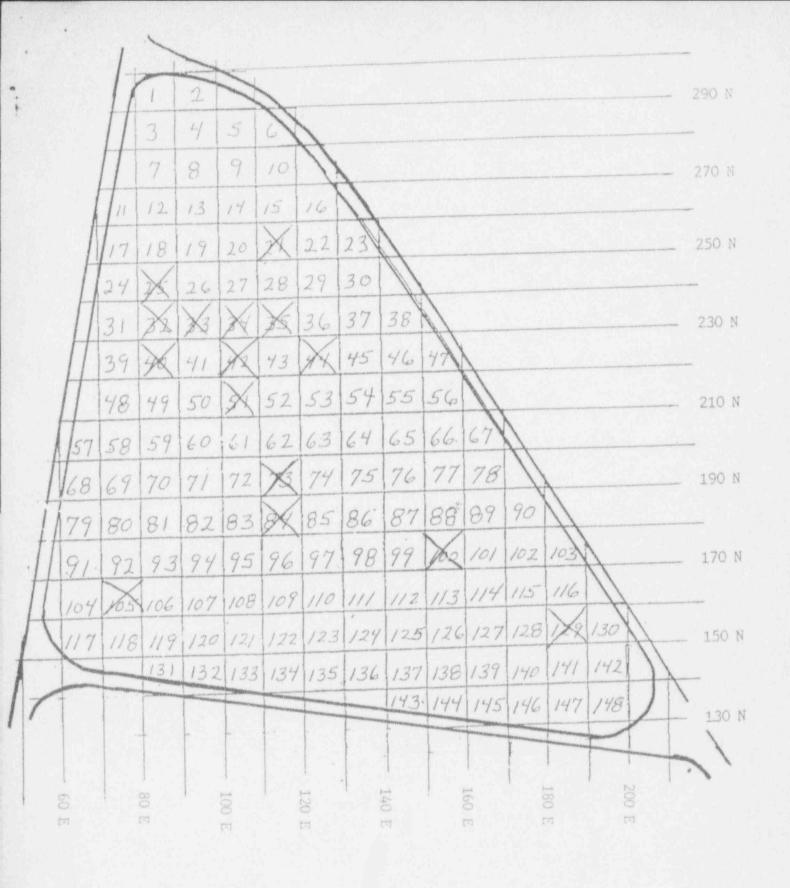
Plot Plan of Southerly Wastewater Treatment Plant
